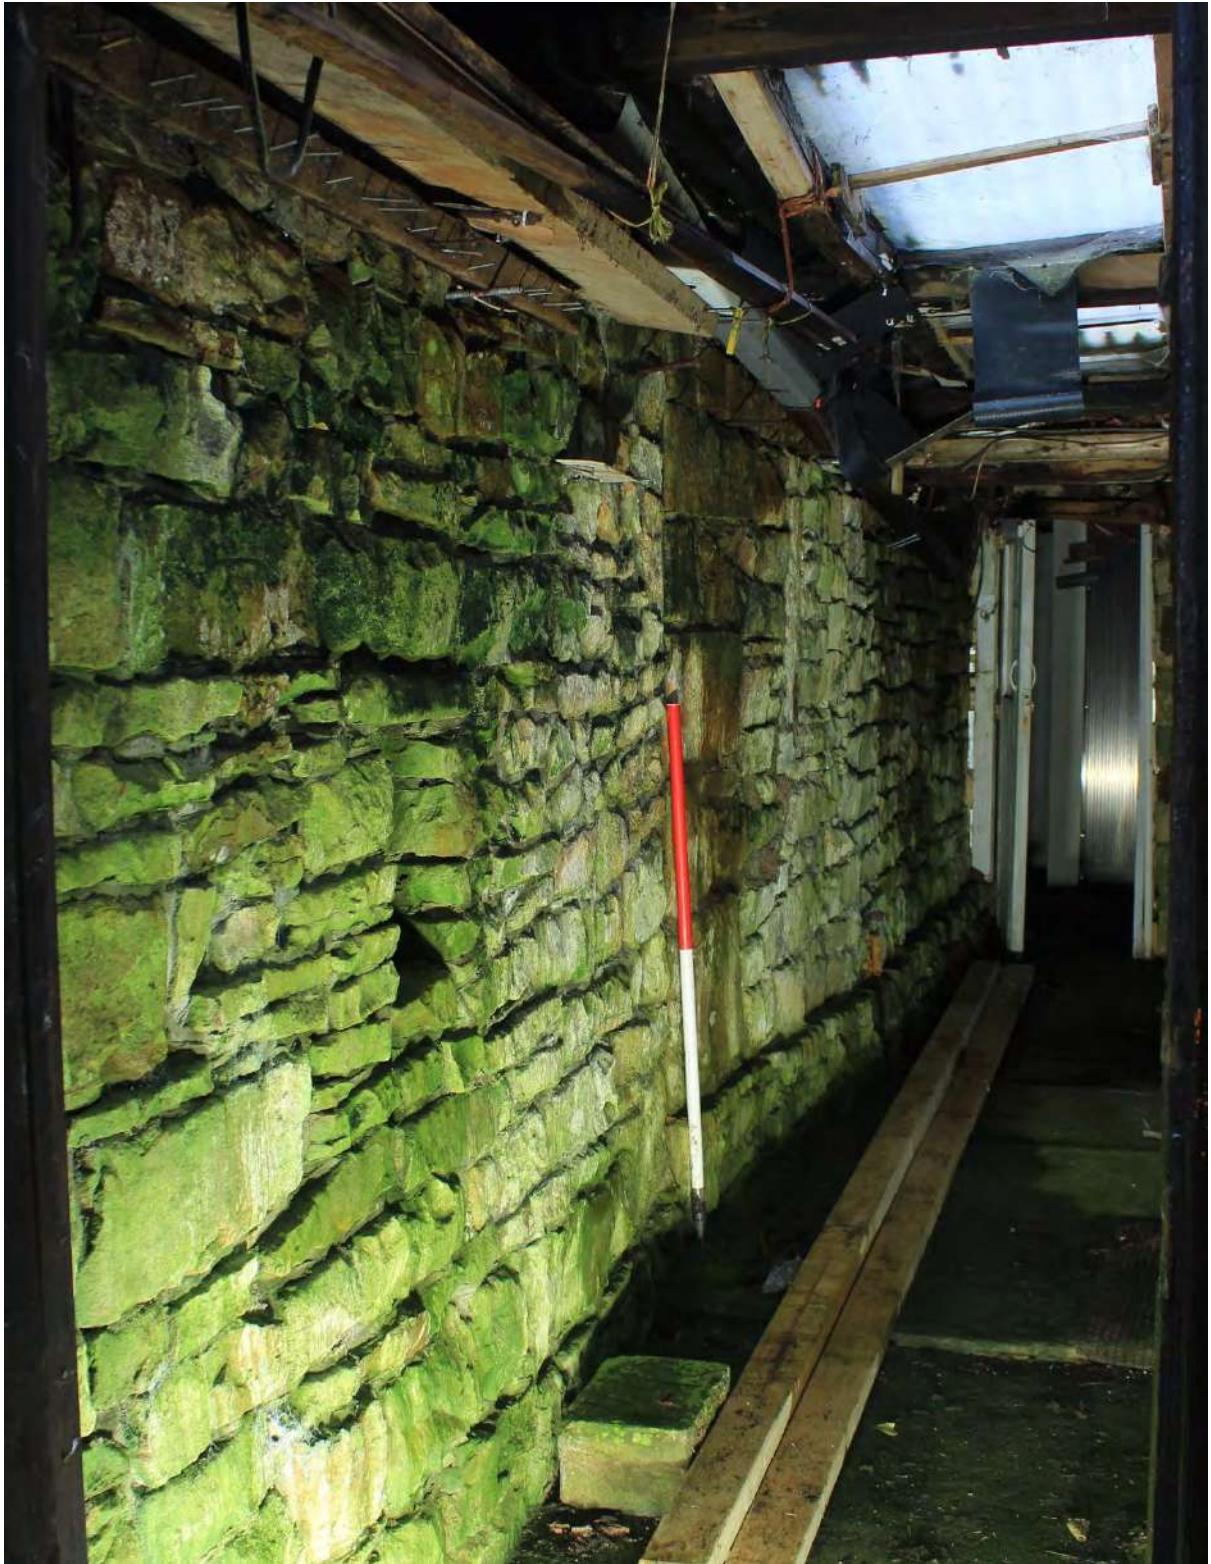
Stone wall (Wall D right) and (Wall E left) to the south of Building B, looking south-west
